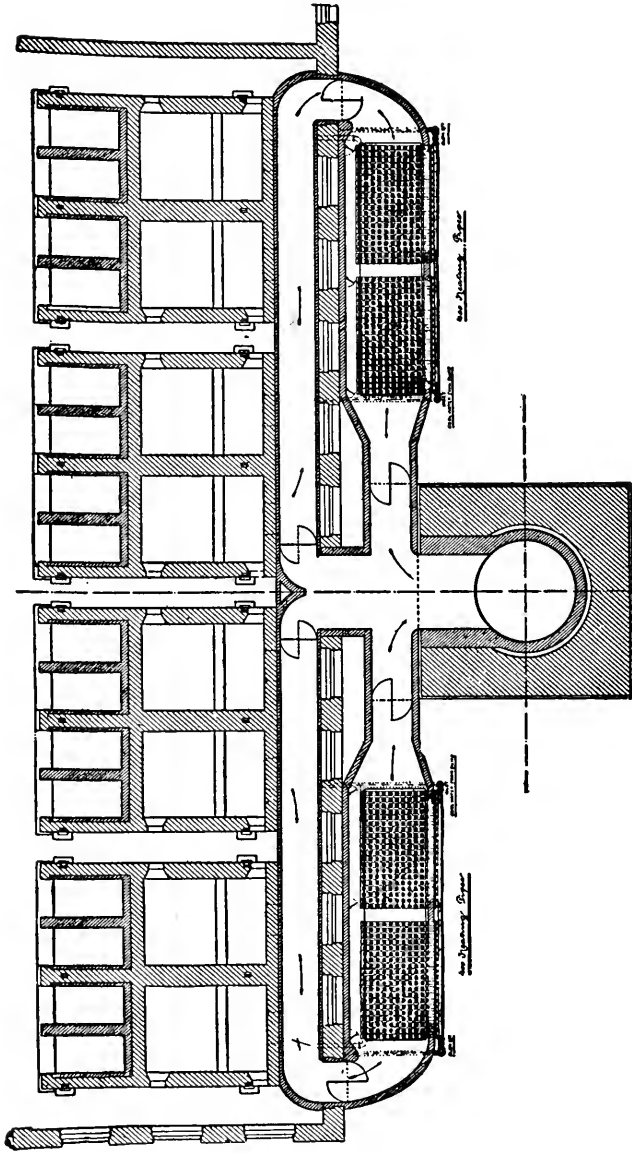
LAYOUT OF LARGE BOILER HOUSE WITH ECONOMIZERS LOCATED OUTSIDE, SHOWING FLUE CONNECTIONS AND METHODS OF BY-PASSING
